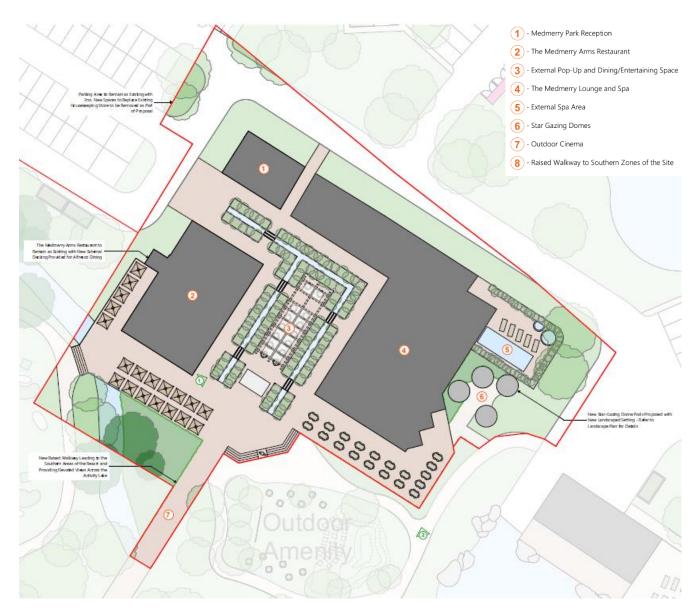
Medmerry Village Proposed Site Plan – Not to scale
